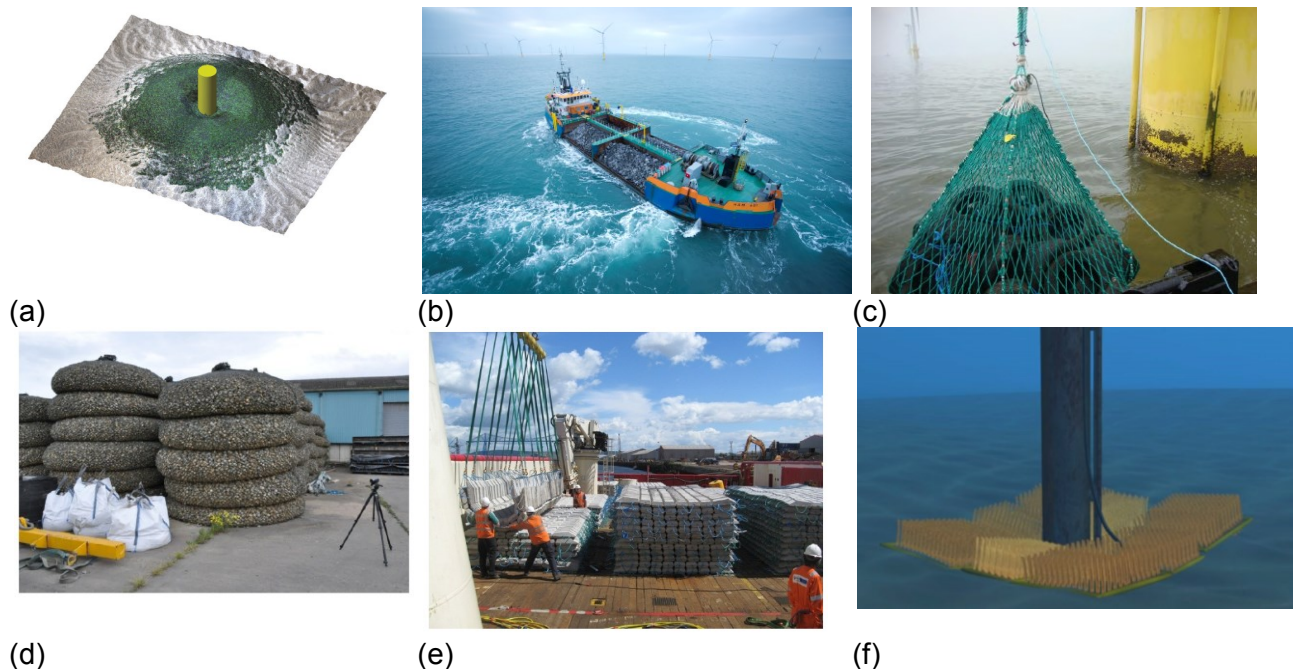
Some example scour protection systems: (a) Pre-installed rock armour in model testing (from Riezebos et al., 2016); (b) Typical side dump vessel used for rock placement (photo credit: Van Oord); (c) Tyre-filled nets being installed at Scroby Sands offshore wind farm (photo credit: Norfolk Marine); (d) Filter unit rock-filled nets (photo credit: HR Wallingford); (e) Articulating concrete block mattress (photo credit: Pipesield Ltd); (f) Fronded mats (credit: Seabed Scour Control Systems Ltd).
